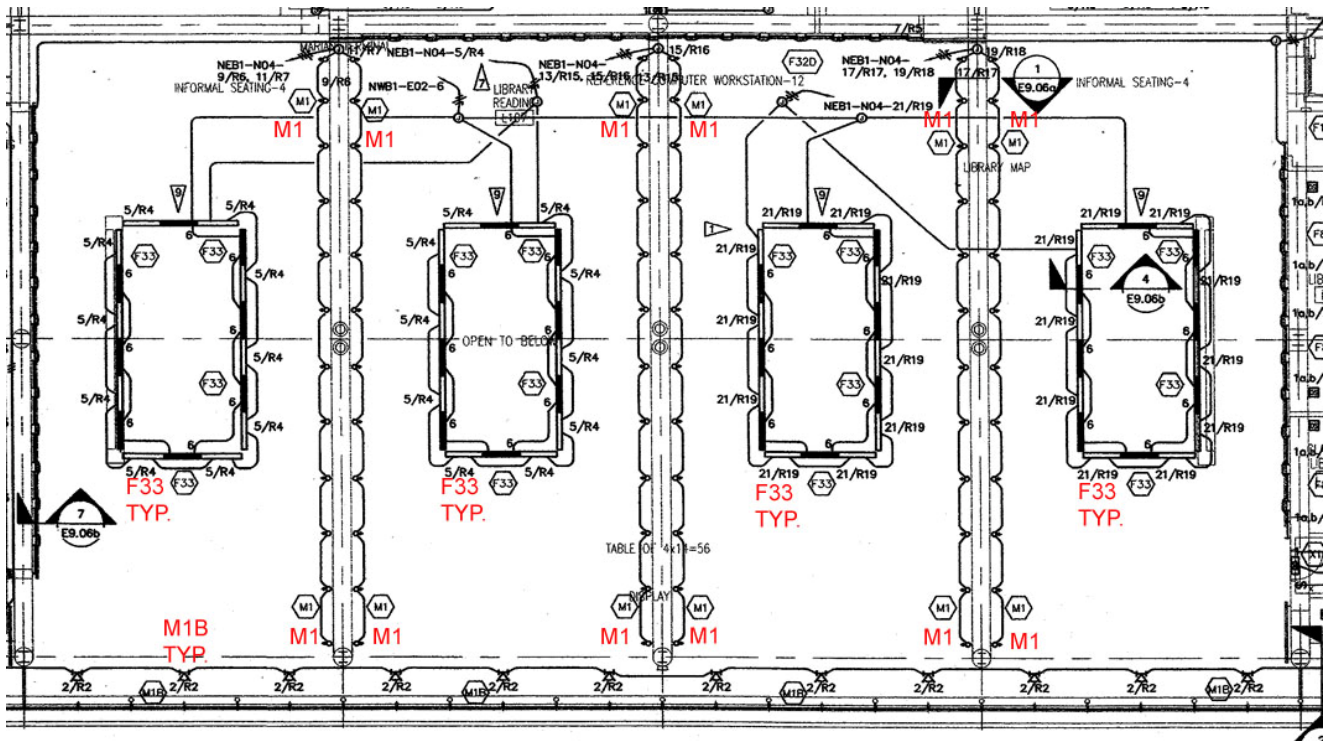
Level L1 Library Reading Area Lighting Floor Plan
